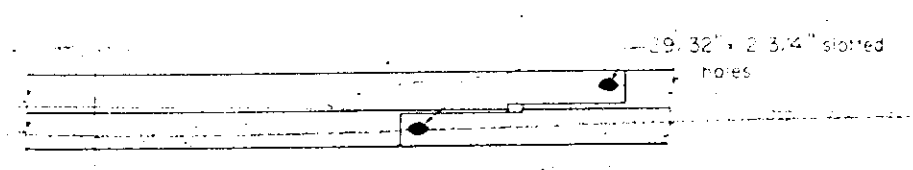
DETAIL OF STANDARD TUBULAR THRIE BEAM FOR LAP SPLICE JOINT
